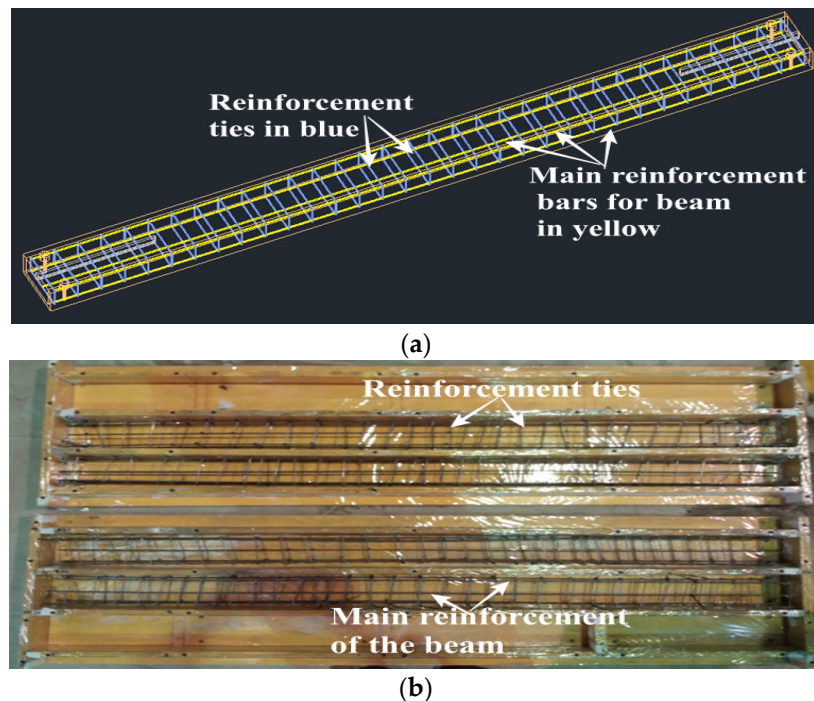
Details of beam reinforcement: (a) AutoCAD drawing; (b) laboratory experiment.
